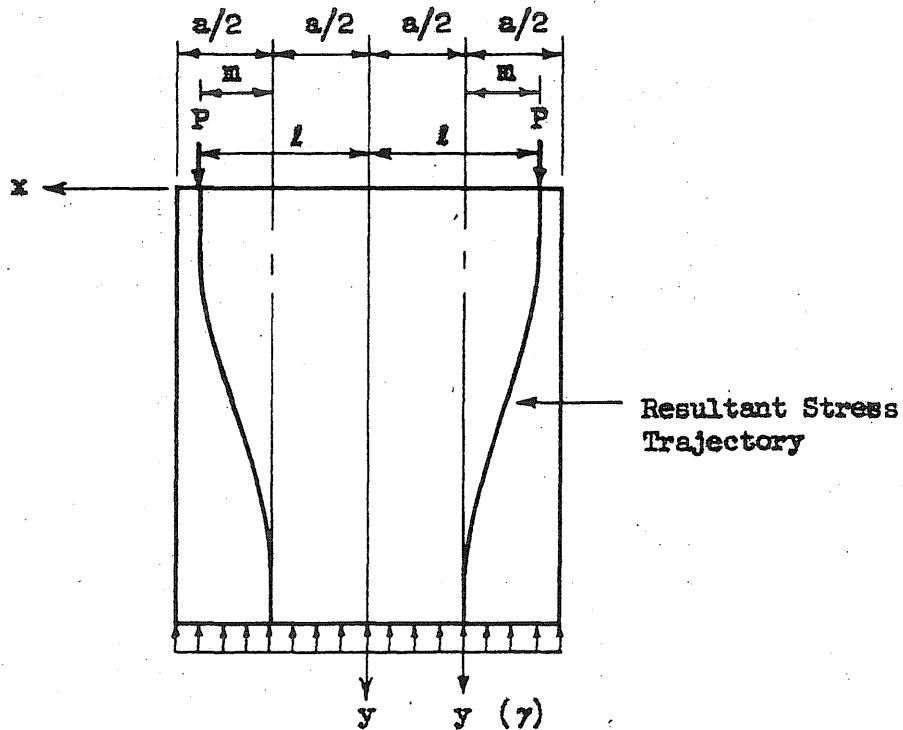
LOADING ARRANGEMENT - SIEVERS
